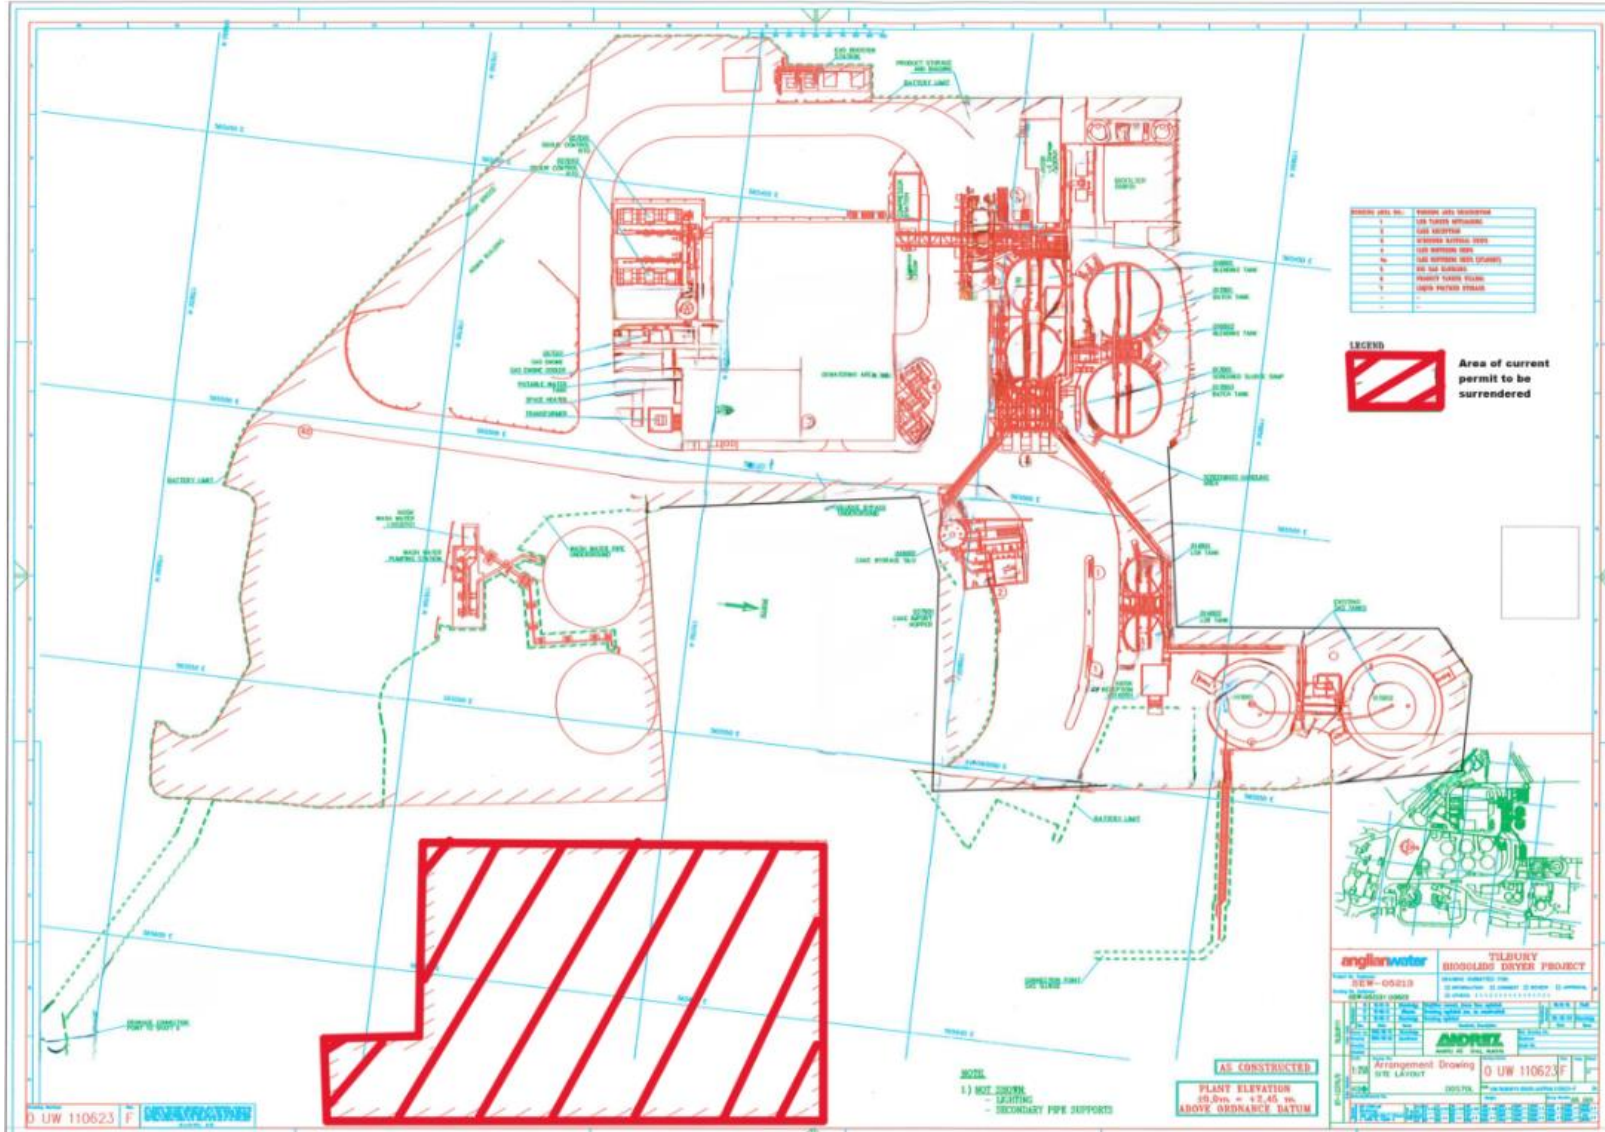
Site drainage plan with red line boundary of permit area to be surrendered
